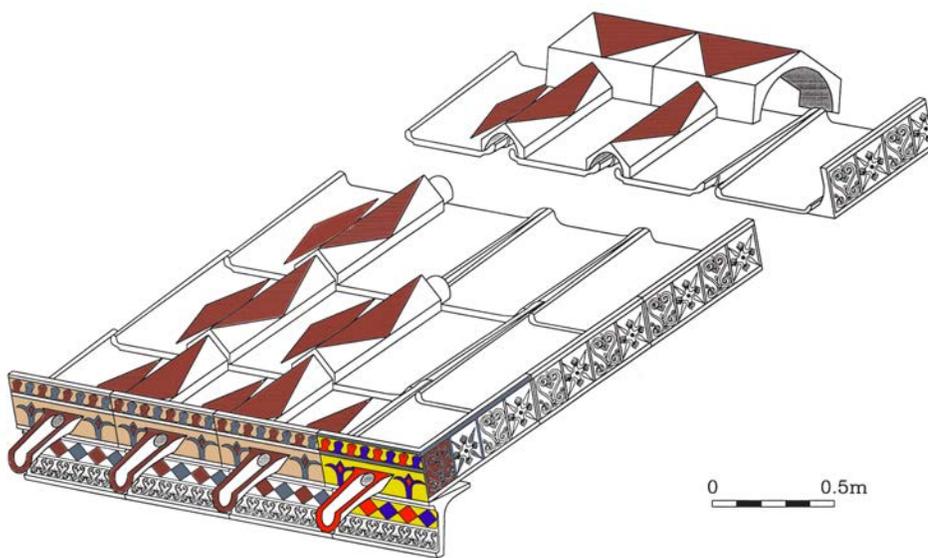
Reconstruction of the roof system in Area 4. Original drawing by Matthew Glendinning adapted by Gebhard Bieg.
